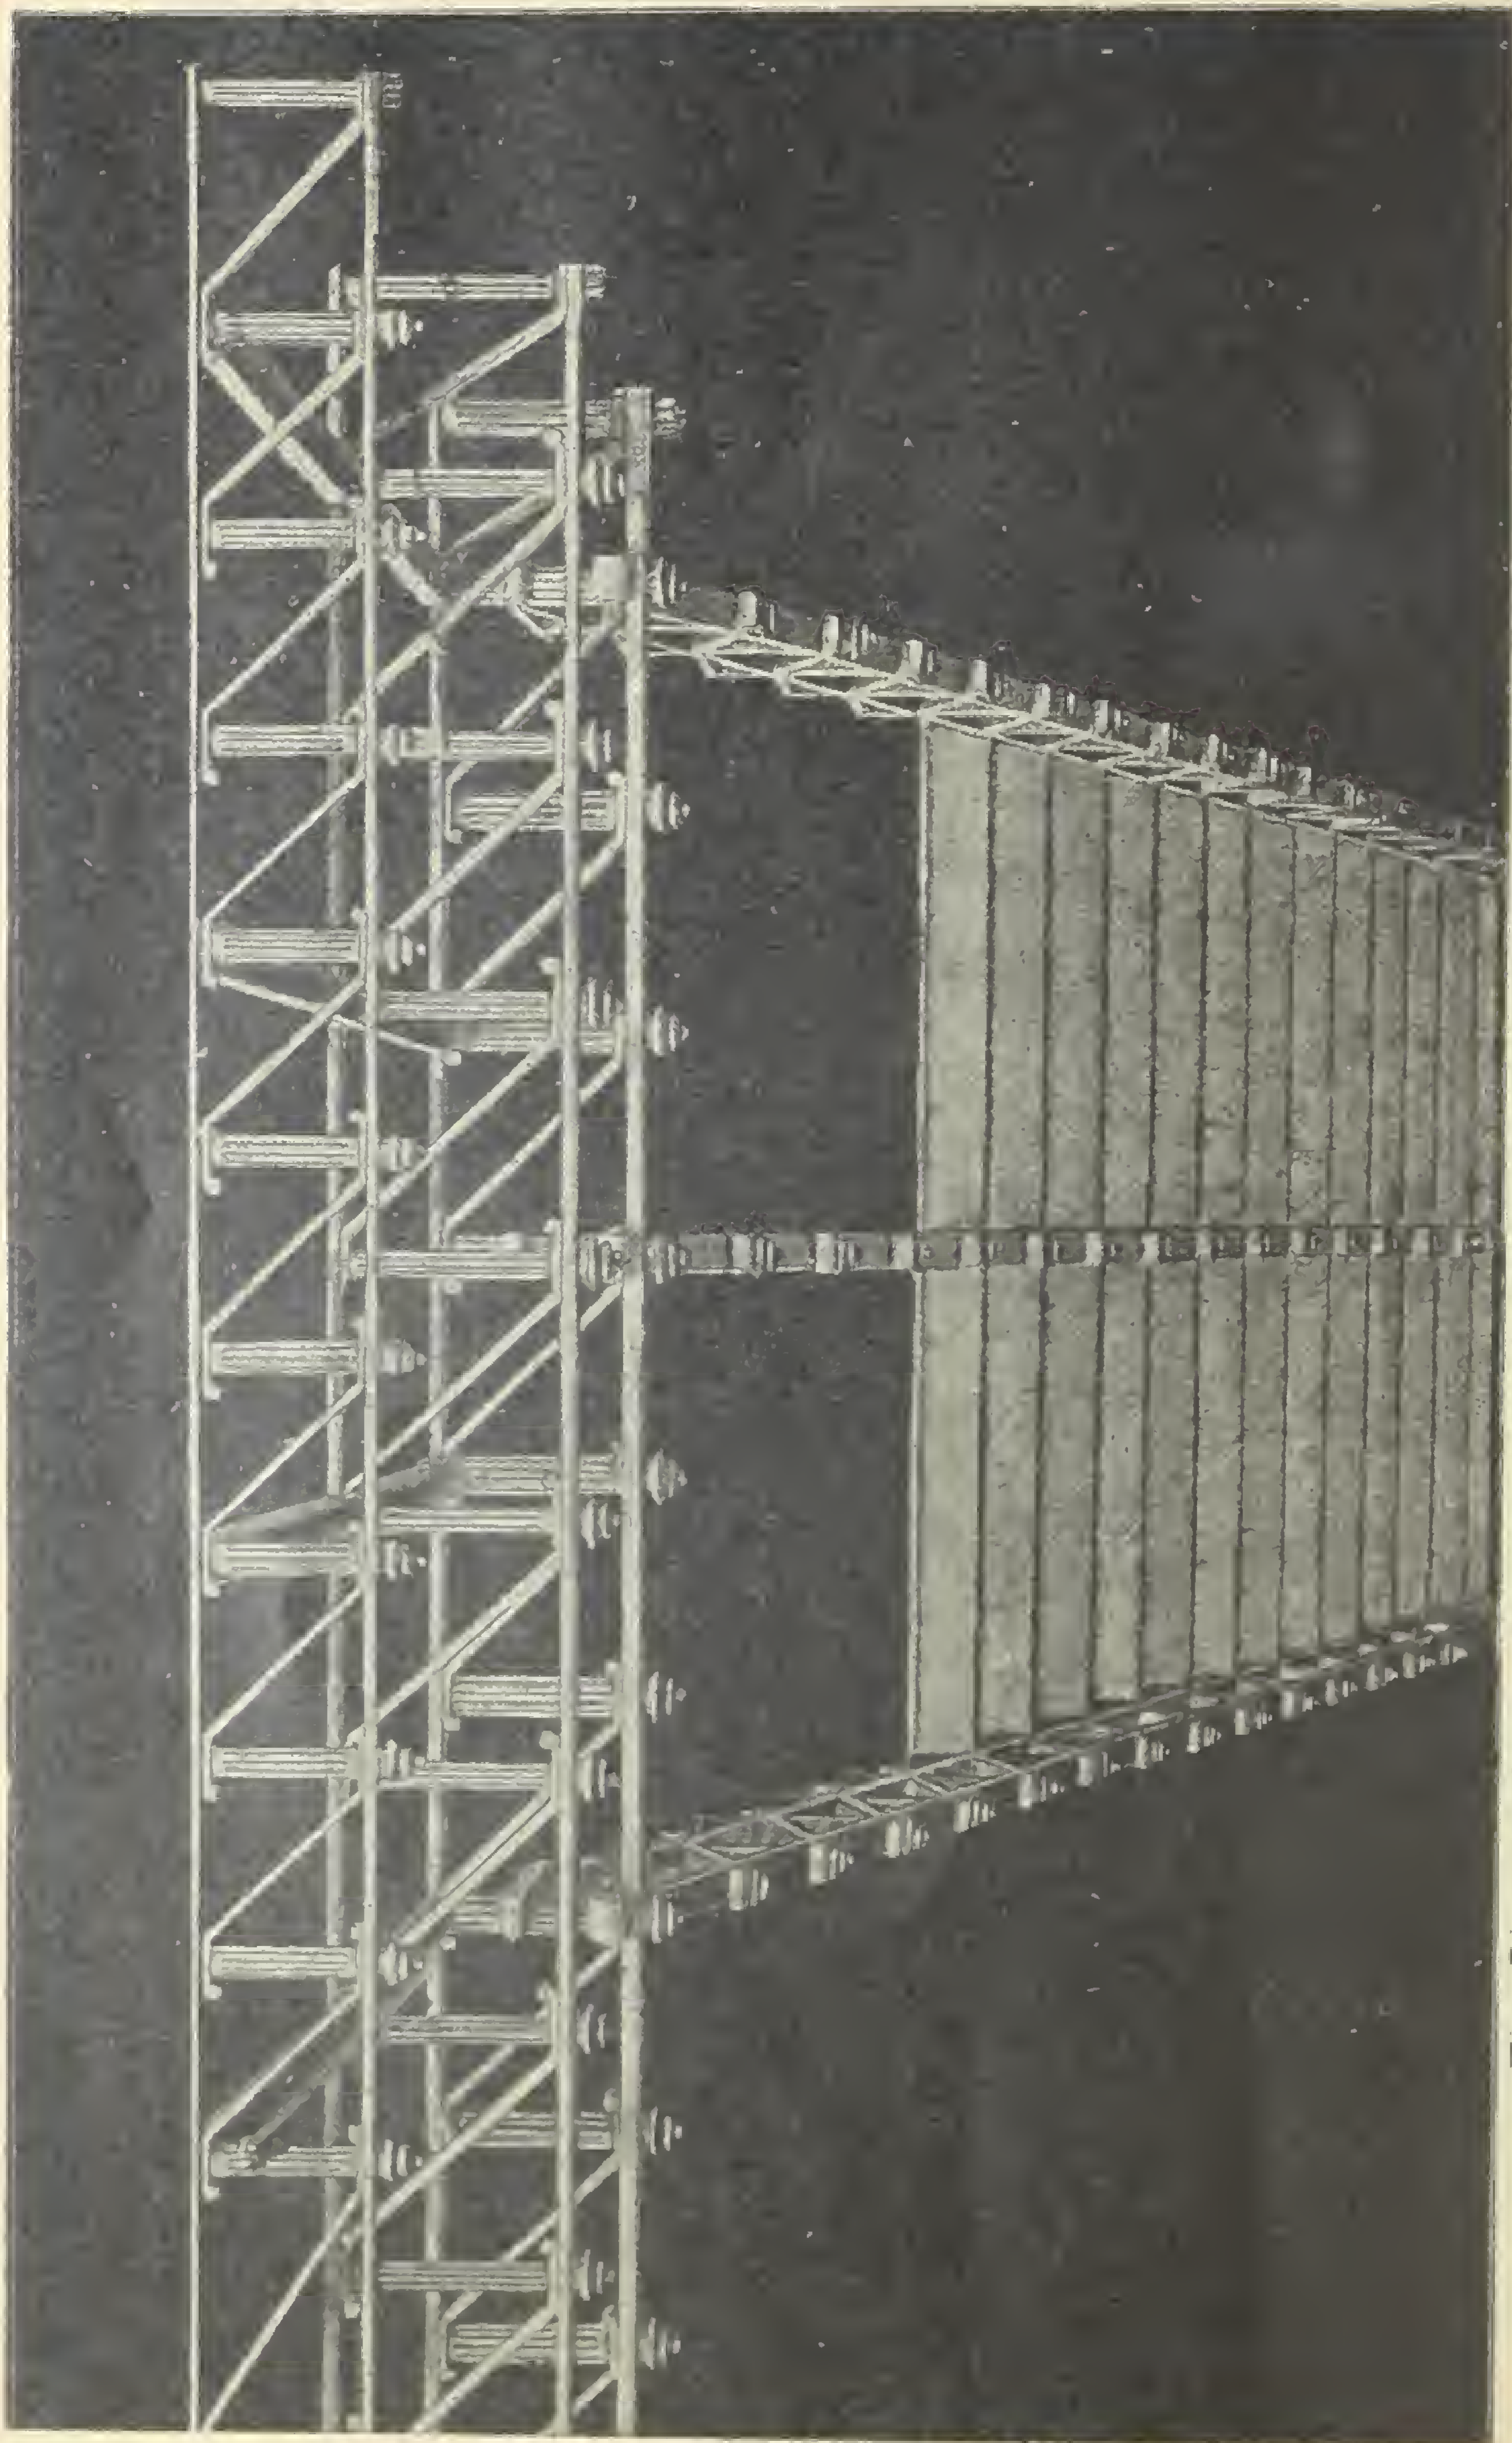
Joly's patent stair and landing construction (in course of erection).
